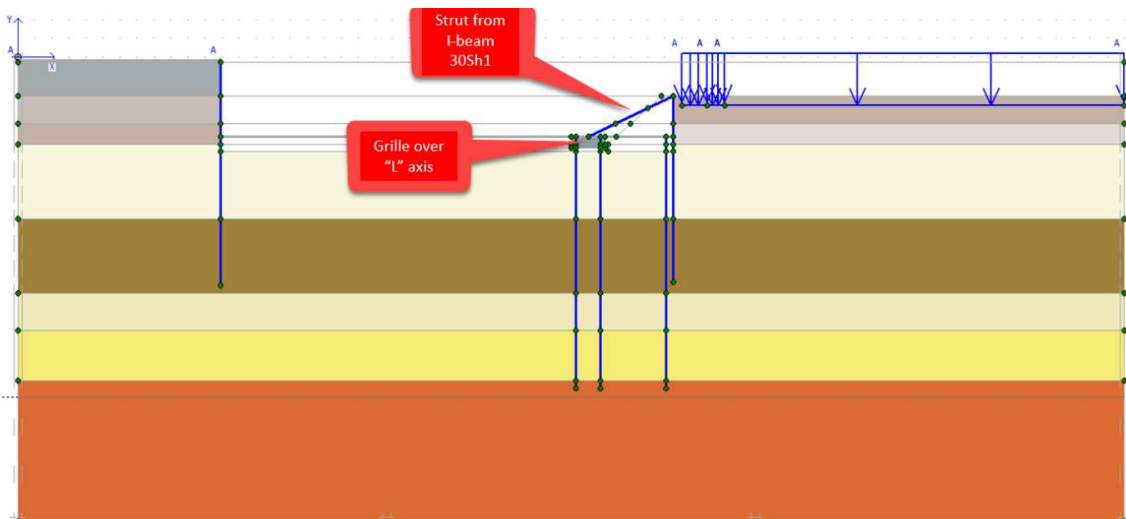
Stage 4 of the excavation shoring erection in section 1-1
